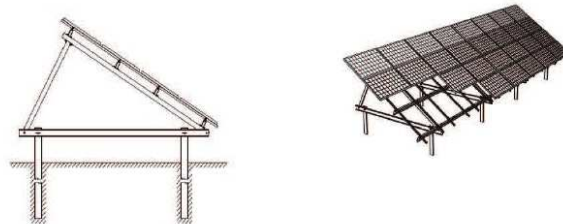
Foundation Alternatives, referred to above. Source: DSR Aurecon
